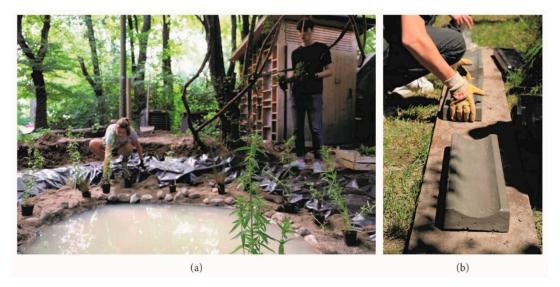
(a) The shore zone of the pond is planted with marsh plants. (b) The swale stones are poured and dried on site.
